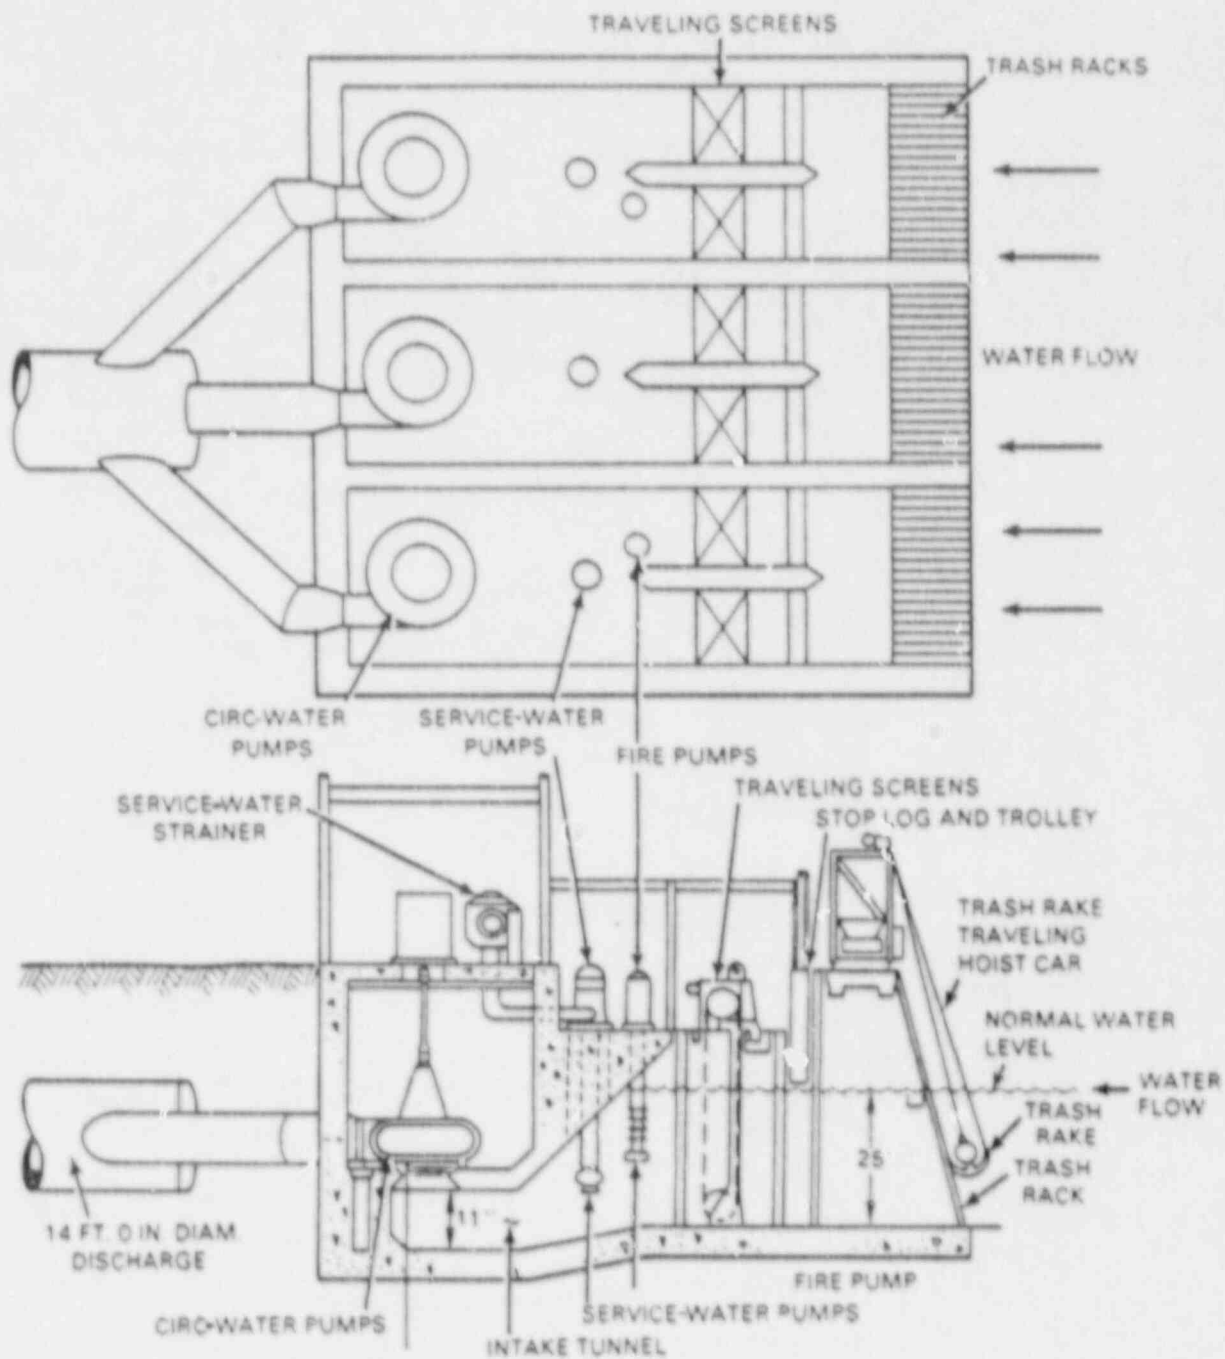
Plan and Elevation View of a Typical Shoreline Water Intake Structure
